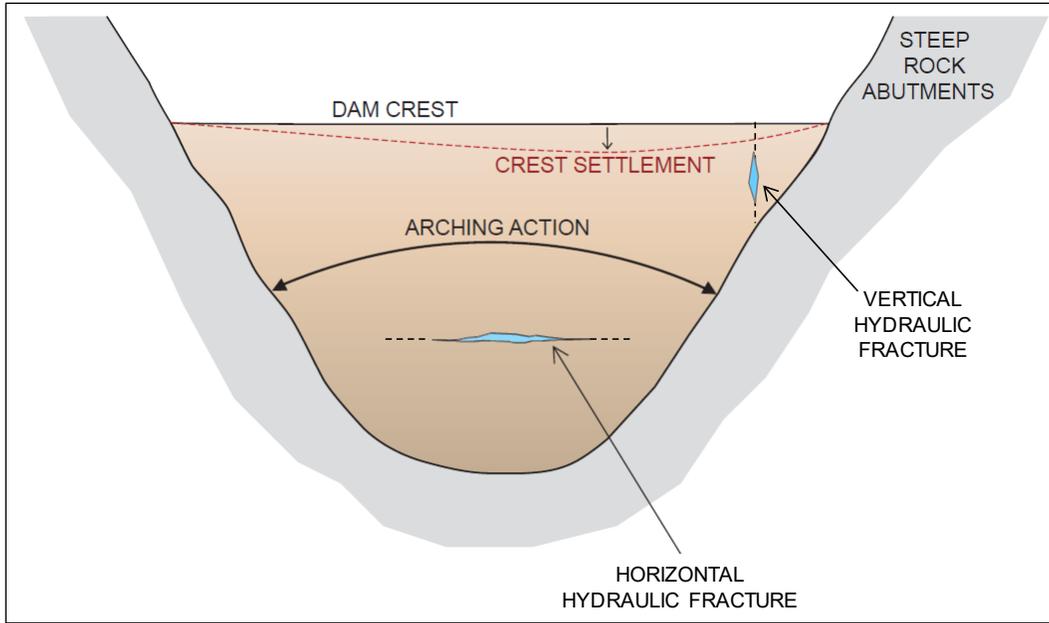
C-4.—Cracking and hydraulic fracture due to cross-valley arching and steep abutment slopes (courtesy of Mark Foster).
